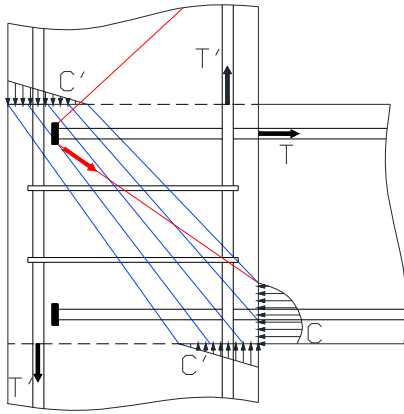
Headed bars as beam bars terminated within exterior beam-column joints
